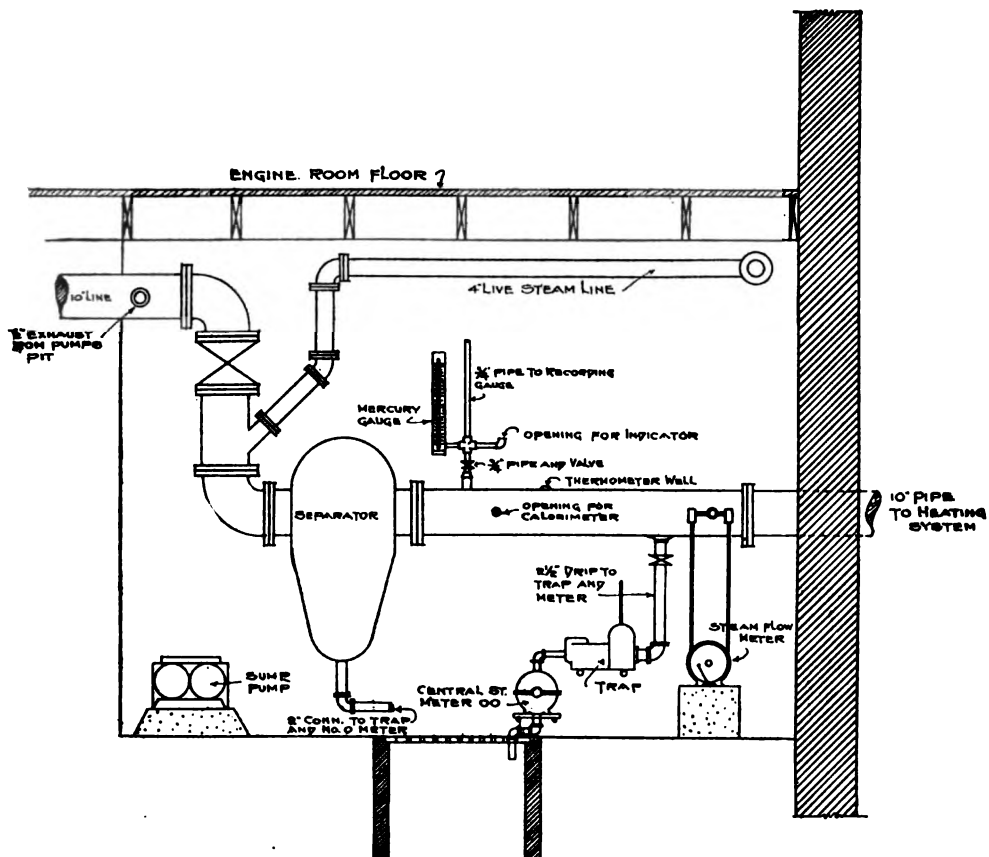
ELEVATION OF PIT IN BOILER ROOM CONTAINING DUPLEX PUMPS, CALORIMETER, ETC.
